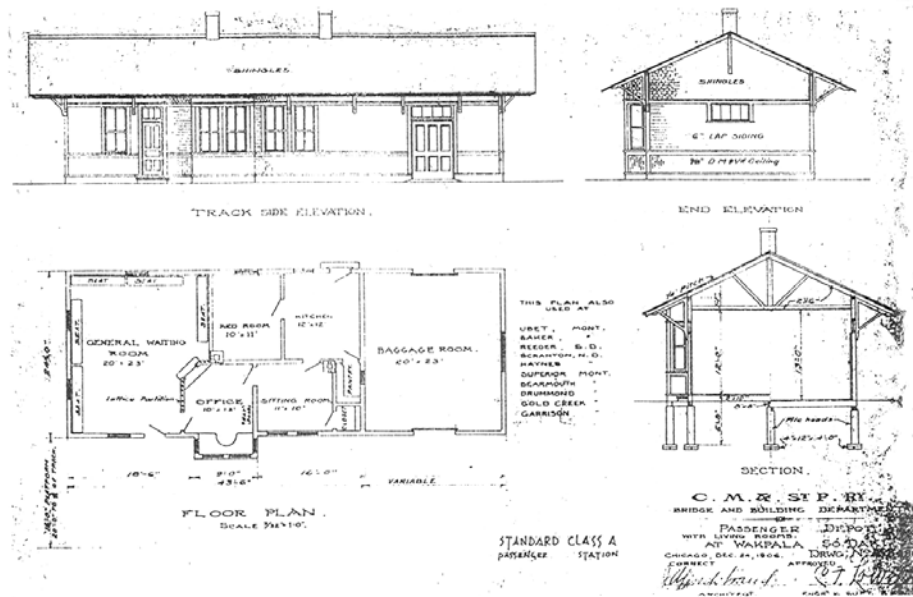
Example of a standardized Milwaukee Road depot plan (author's collection).
